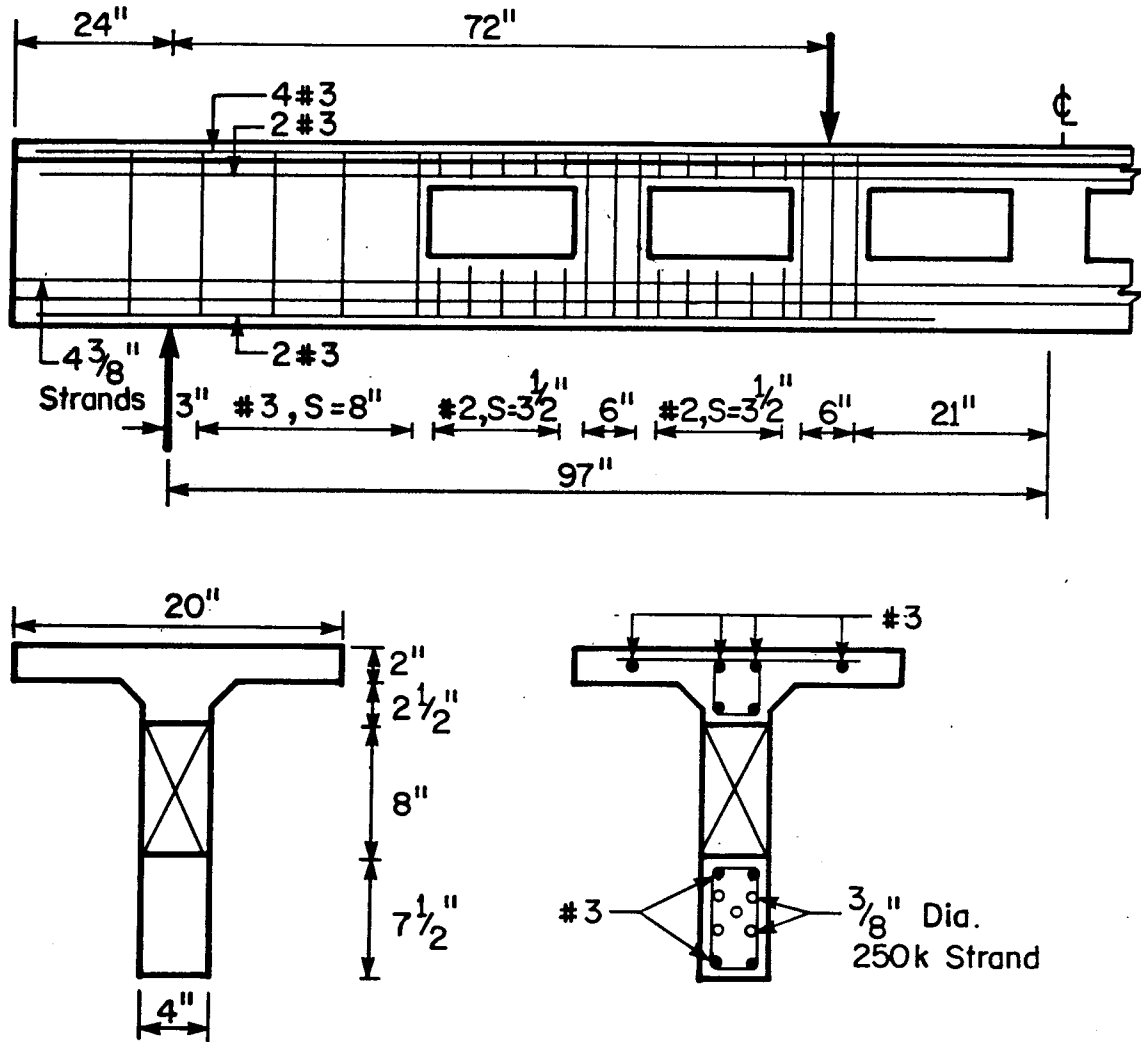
Details of Typical Specimen Tested by Linder.
